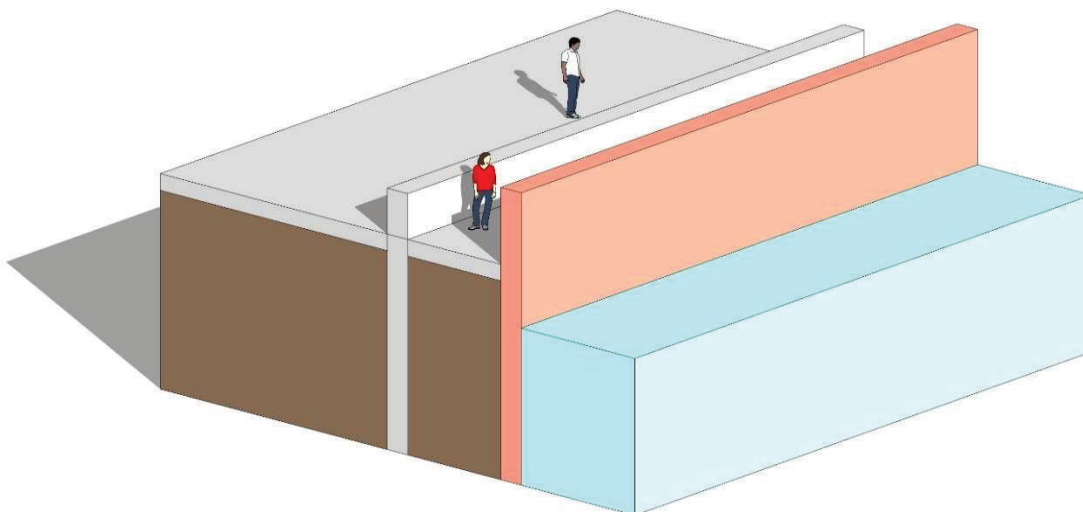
New Wall in Front of Existing Defence Solution Sketch
